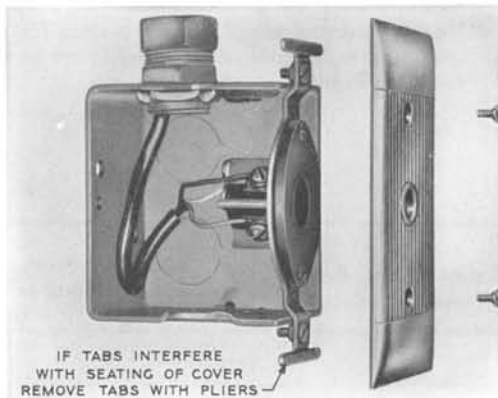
47B CONNECTING BLOCK ON 43A BRACKET MOUNTED IN OUTLET BOX
